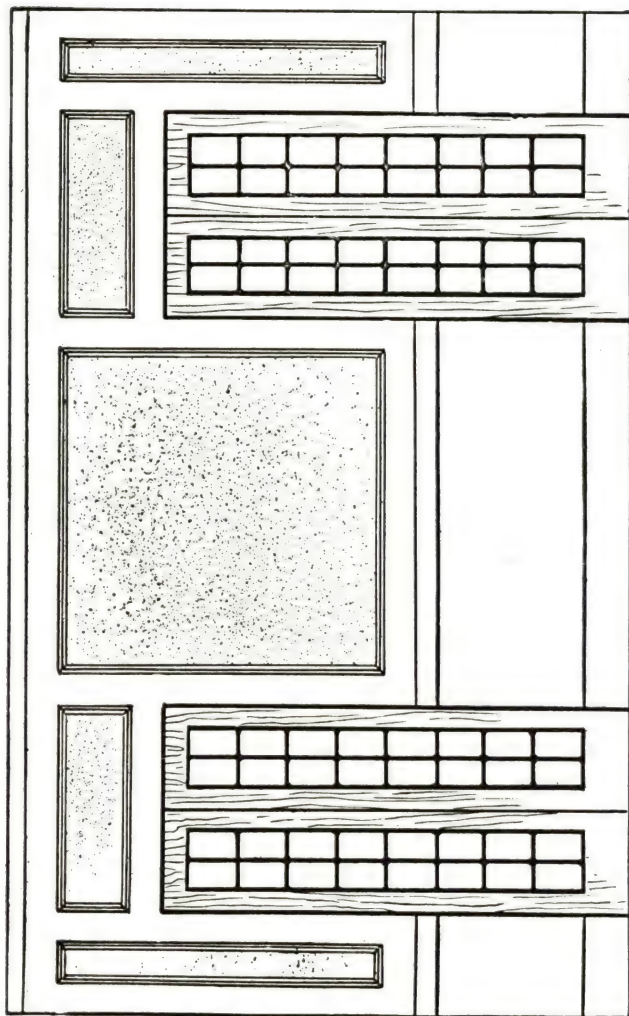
Showing the Manner in Which Wall Panels May Be Artistically Grouped.
